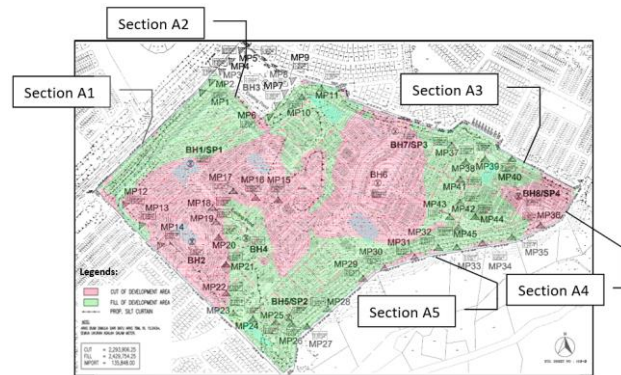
Integration of SI layout and earthwork plans of the proposed development
